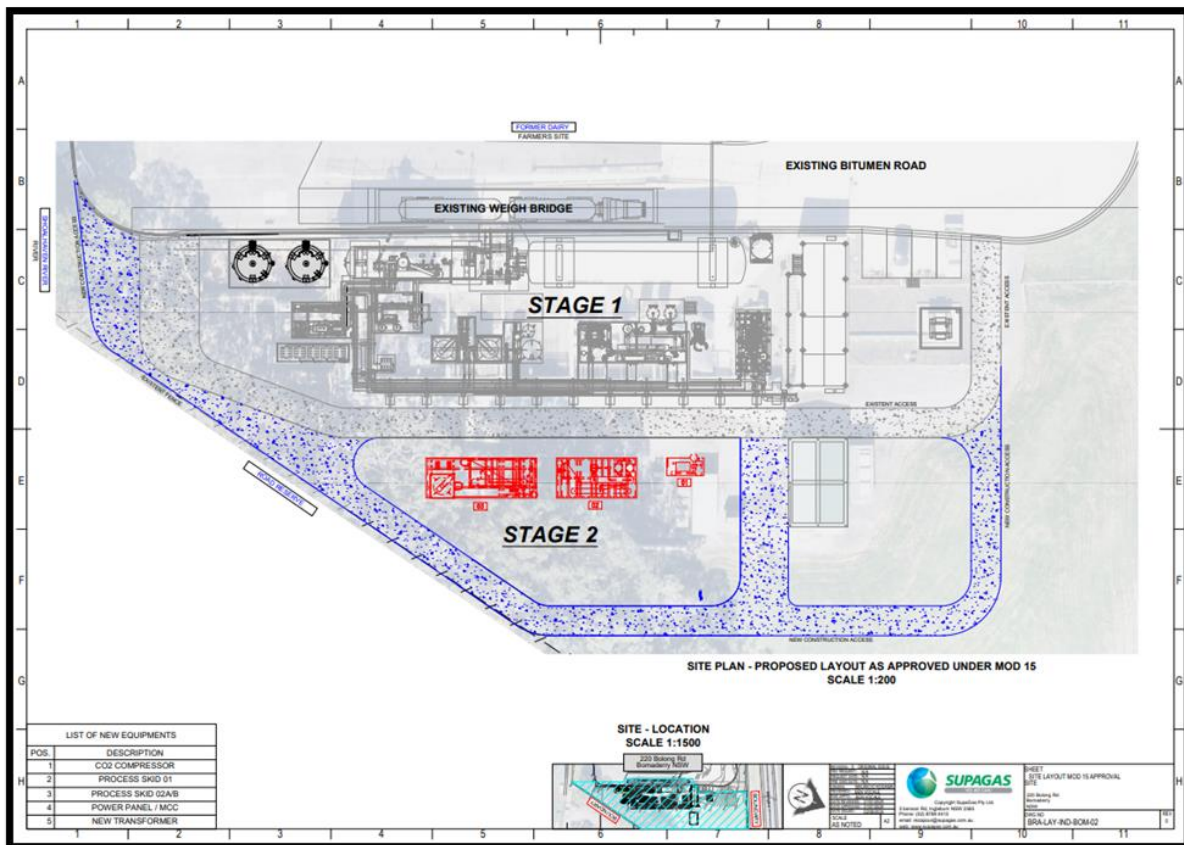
CO₂ Plant Stage 2 layout as approved
